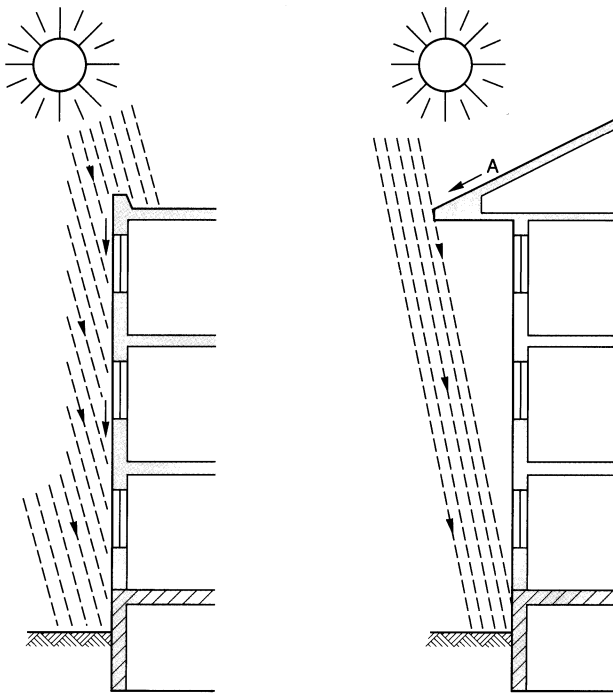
Use of roof overhang to protect external joinery and cladding from rain and direct sunlight
